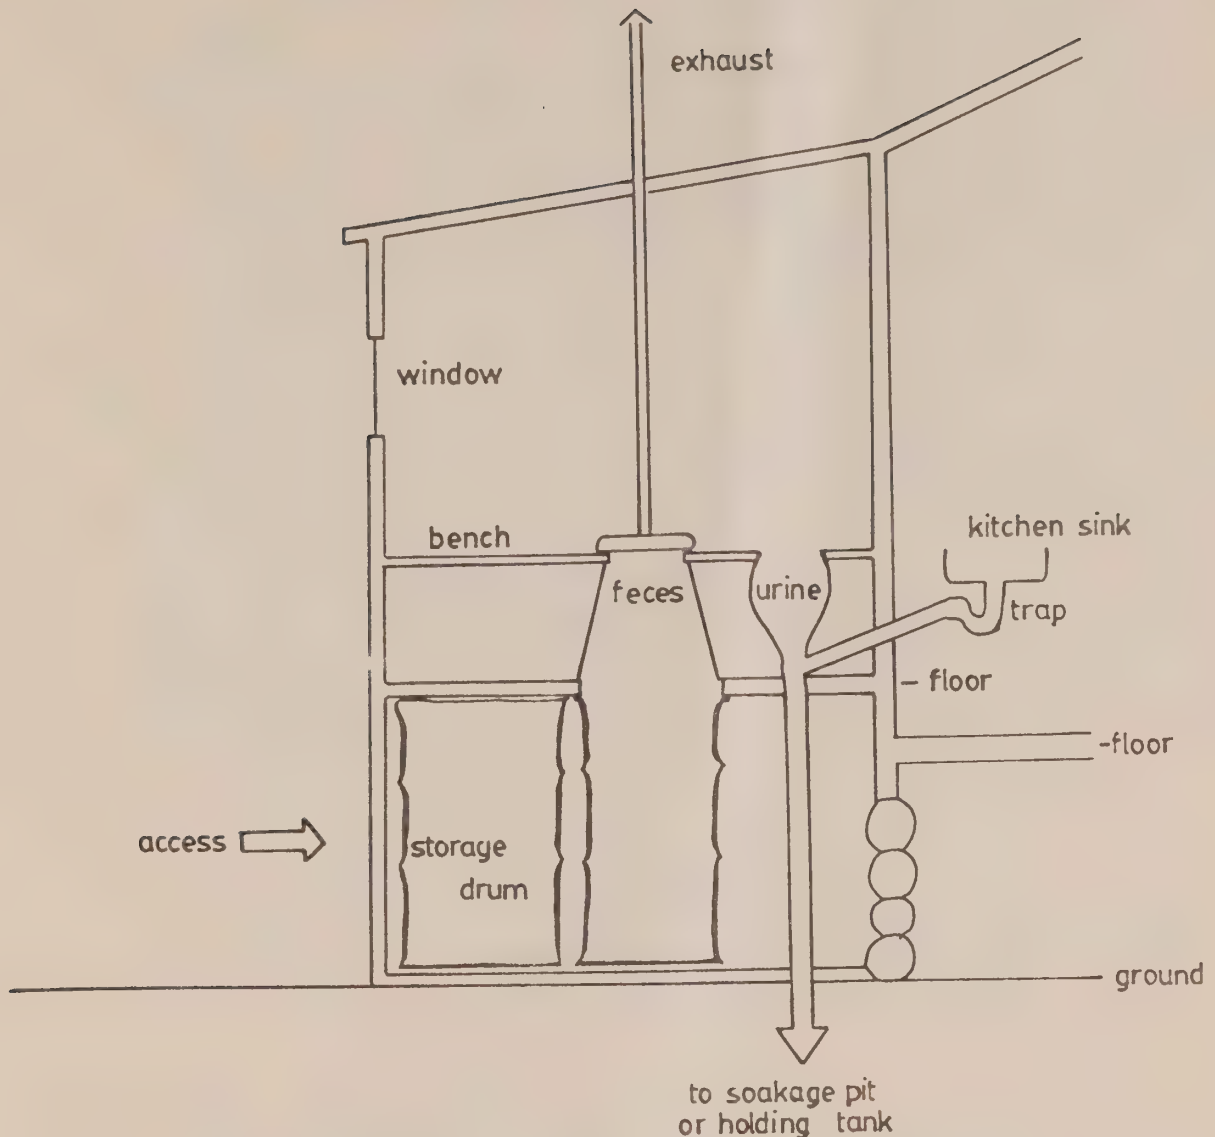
Front section of toilet area added onto existing house. Only solid excreta are collected in drum. Greywater from kitchen area flushes urine drain by gravity flow.
